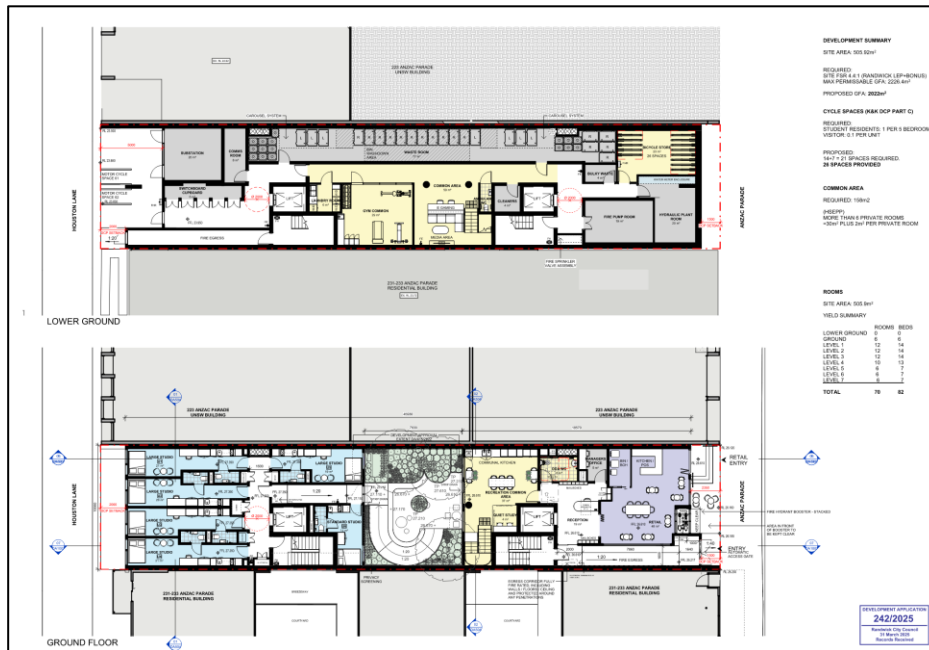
Lower ground floor and ground floor plans (Source: Applicant)
